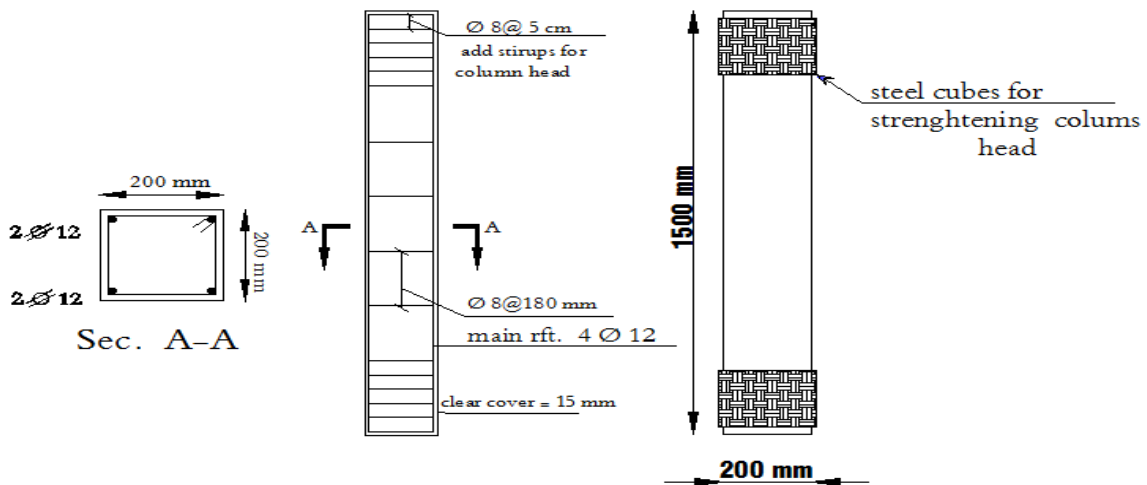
Typical Concrete Dimensions and Reinforcement Details of the Test Columns
